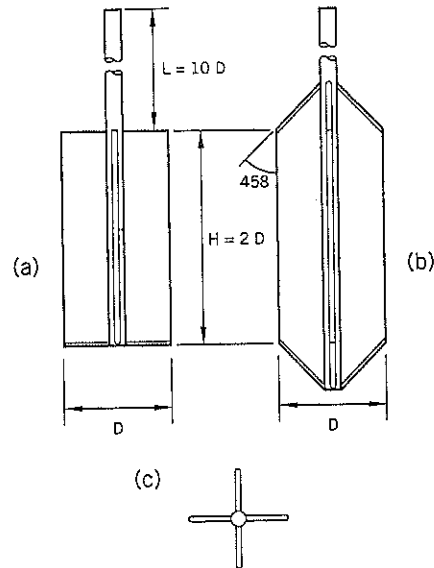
Field vane: (a) elevation of rectangular vane (b) elevation of tapered vane (c) plan view
